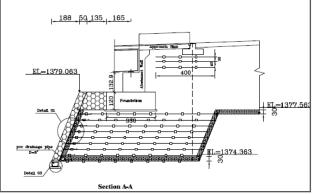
A cross section from Milad GRS bridge abutment (lower wall=3.5m, upper wall=4.0m, total height=7.5m)
